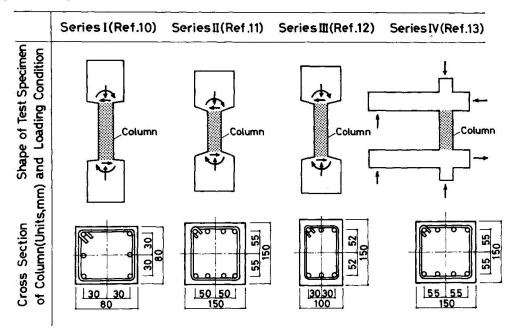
Shear Tests of Ordinary Reinforced Concrete Columns and Frames
